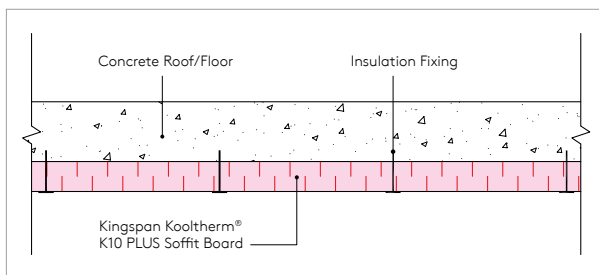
Side elevation - Concrete Soffit with Kingspan Kooltherm® K10 PLUS Soffit Board.
